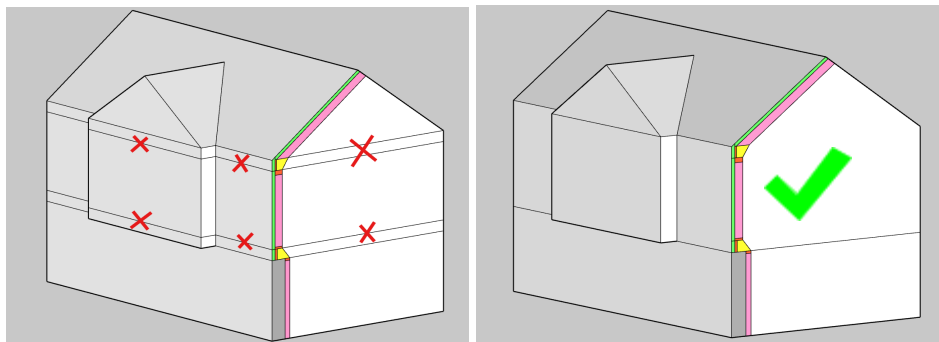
Do not separate rim joists from walls. Extra lines can be erased except where the wall transitions from above to below grade assemblies.
